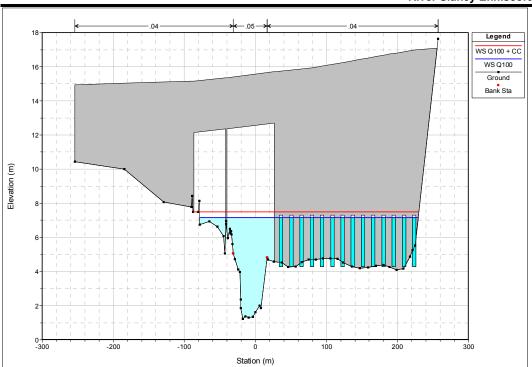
Option 2 - 2 Span Structure with embankment culverts (14 No. 4.8m wide by 3m high)
